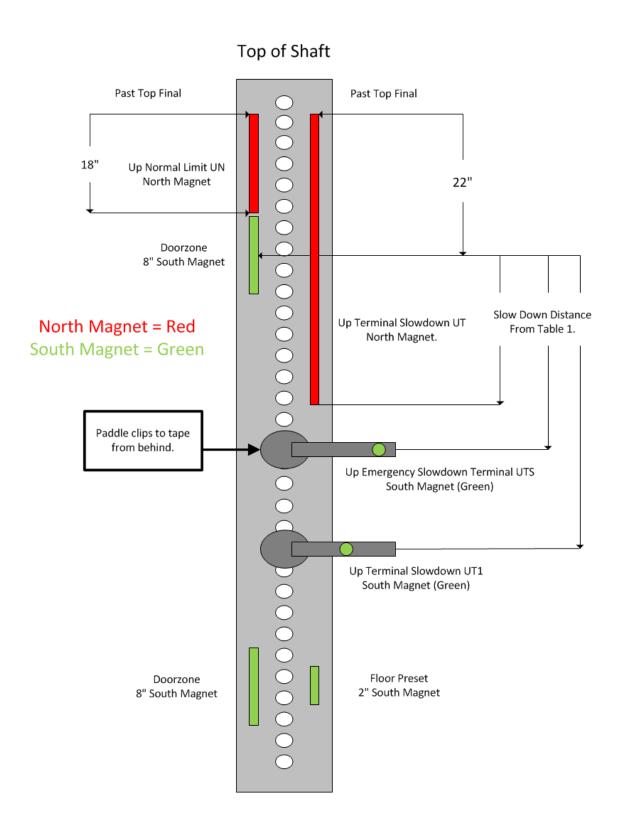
A: Typical Slowdown and door zone layout on tape. (Upper Section)
